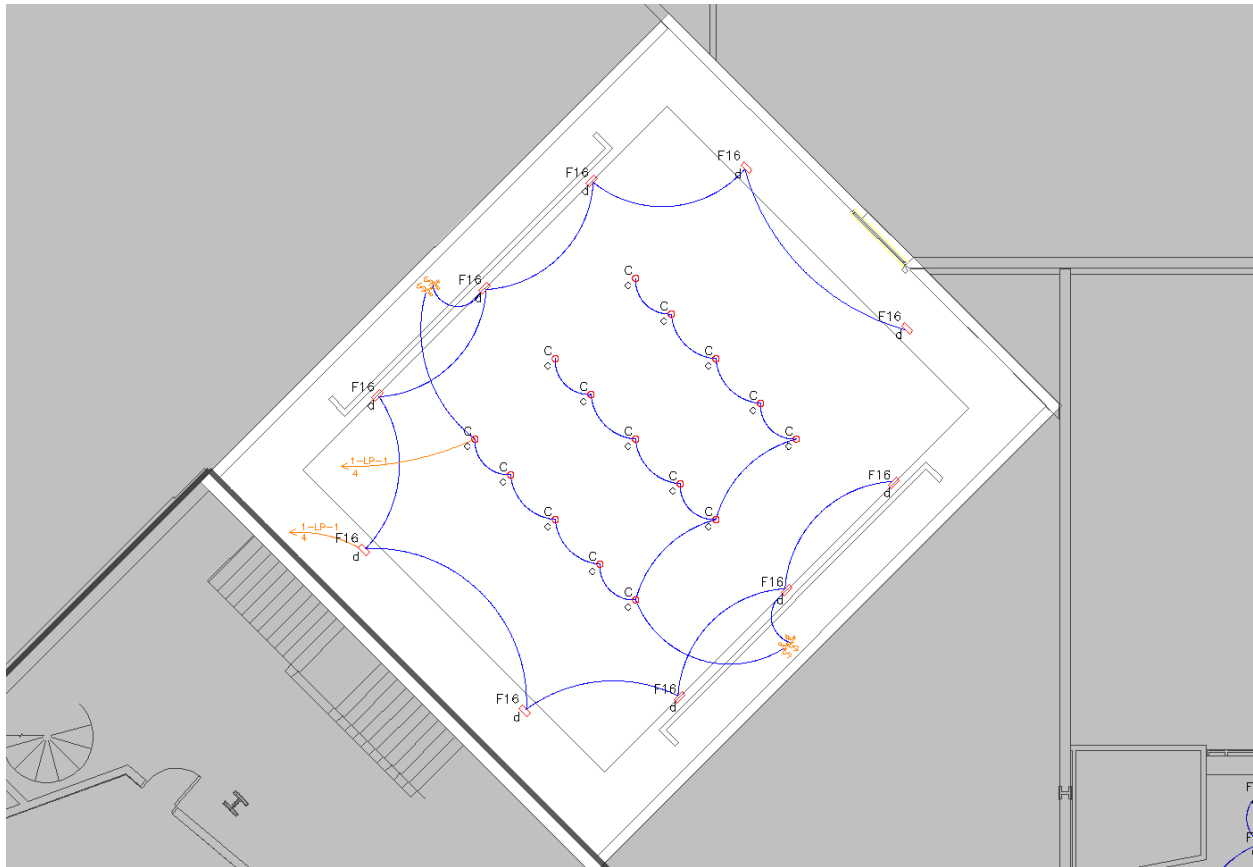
Rehearsal Room – Balcony Level Lighting Plan
